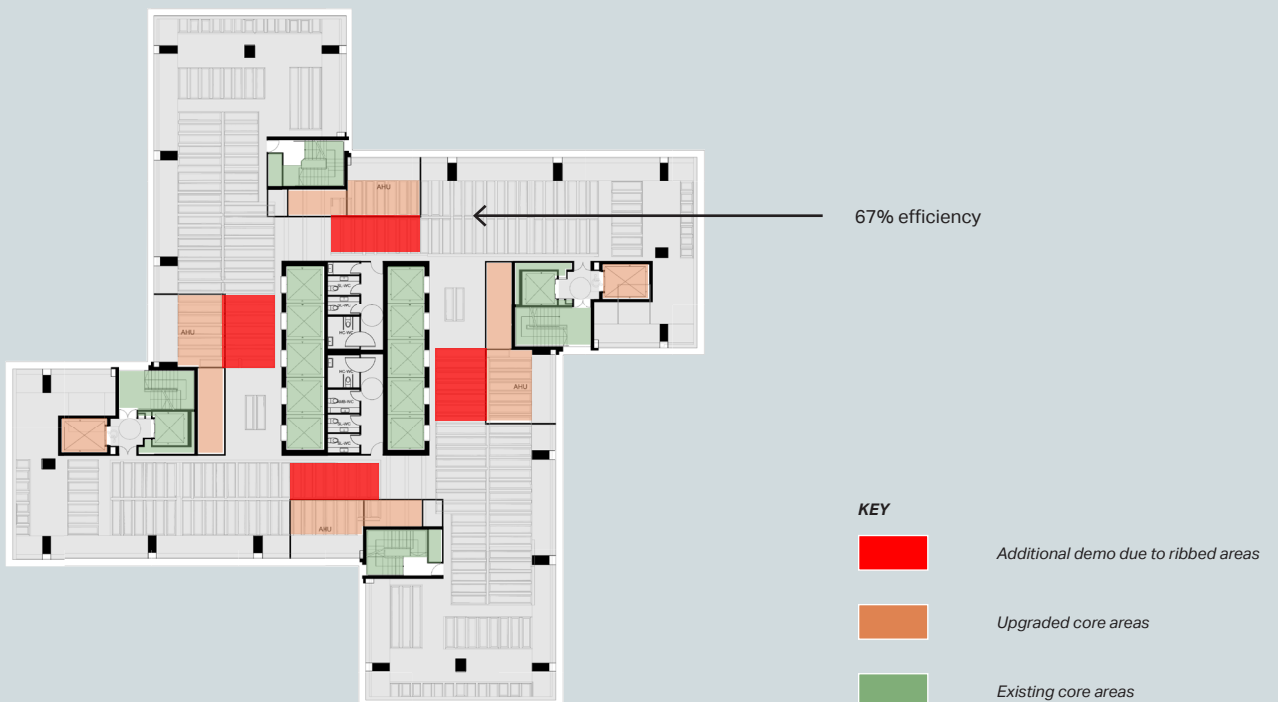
Diagram showing erosion of floor slab and exaggerated penetrations due to upgrades to meet current Building Regulations
